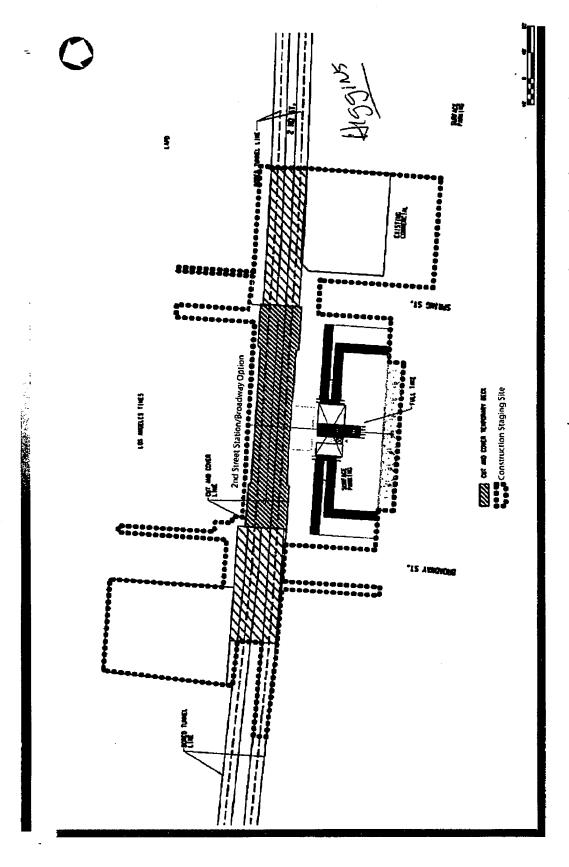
2"/Broadway Station (Underground Emphasis LRT Alternative — Broadway Station Option and Fully Underground LRT Alternative)
